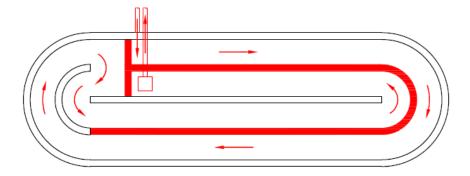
4S Ranch WRF site plan with potential new chlorine contact basin
